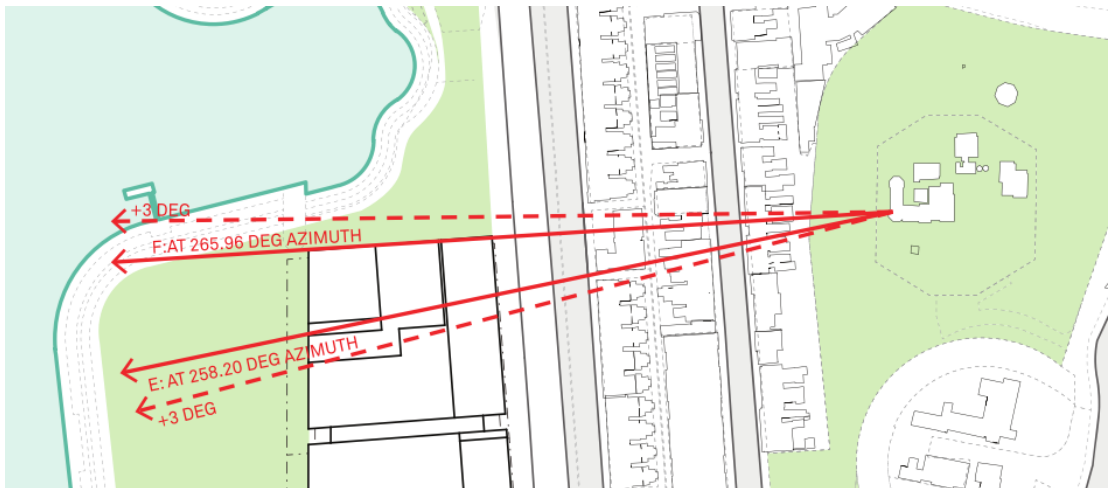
Plan view of the taller tower building envelope footprint showing the azimuth angle projected by the building extremities when viewed from Sydney Observatory south dome.
